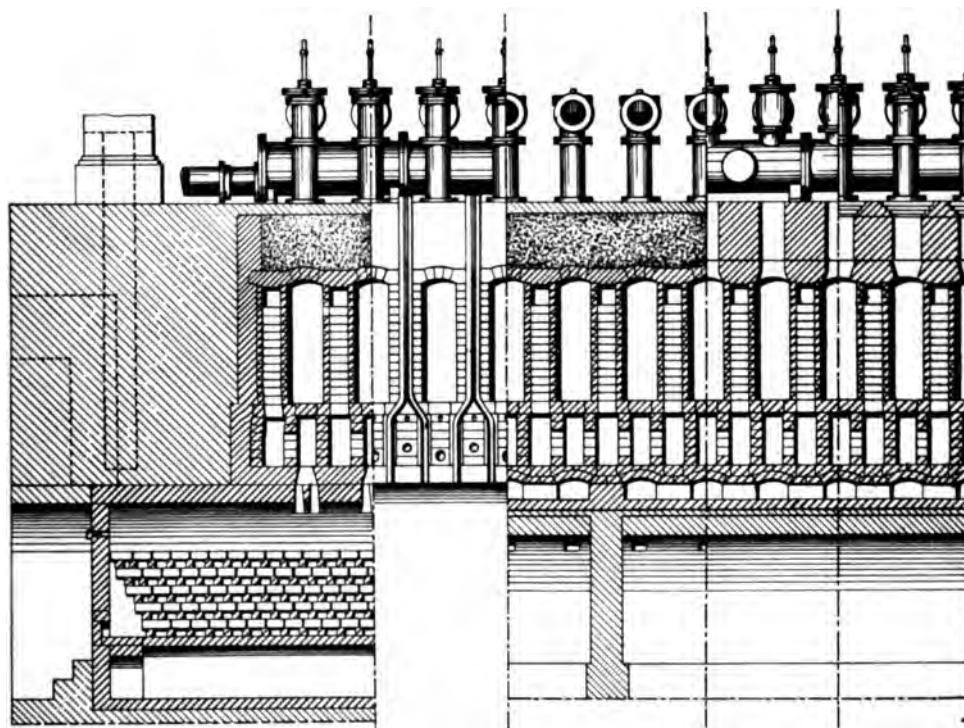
Section Through Regenerator. Elevation Transverse Sections.
